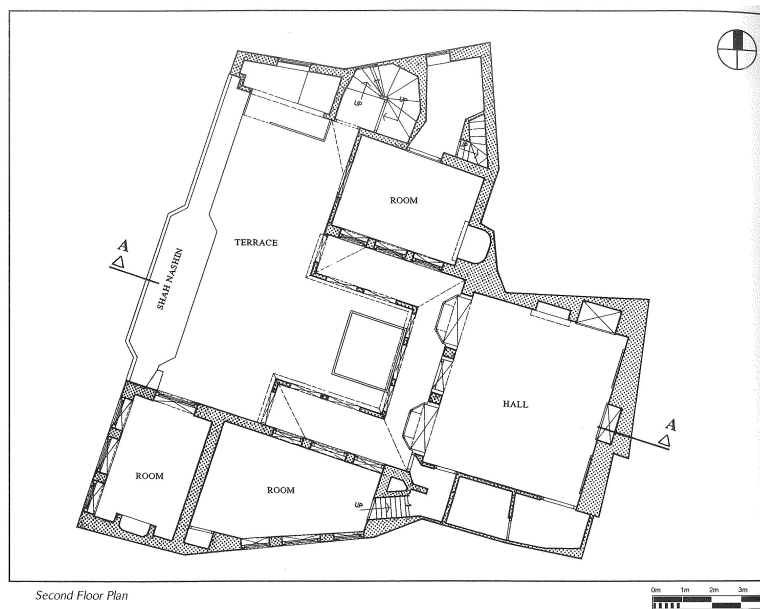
Second Floor Plans of the Lal Haveli in Lahore.
